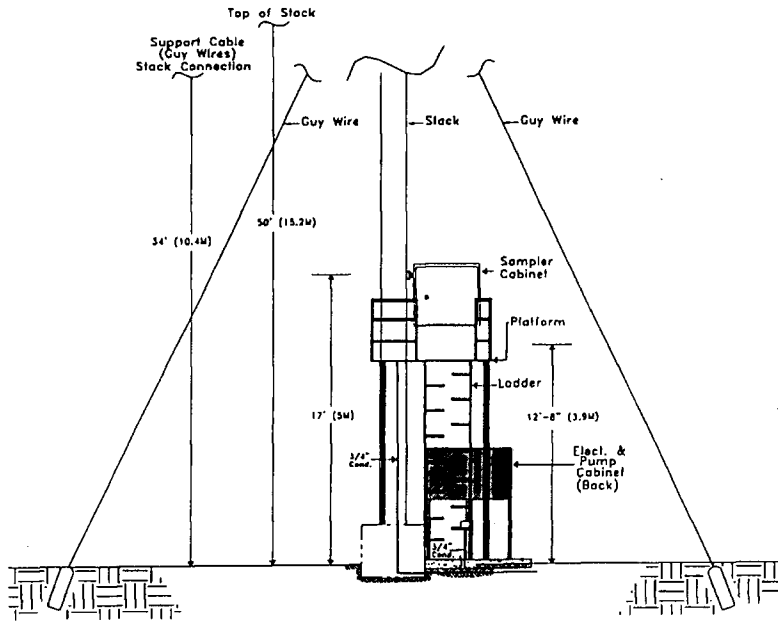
244-CR Vault GEMS Upgrade - Elevation View of Modified Stack
